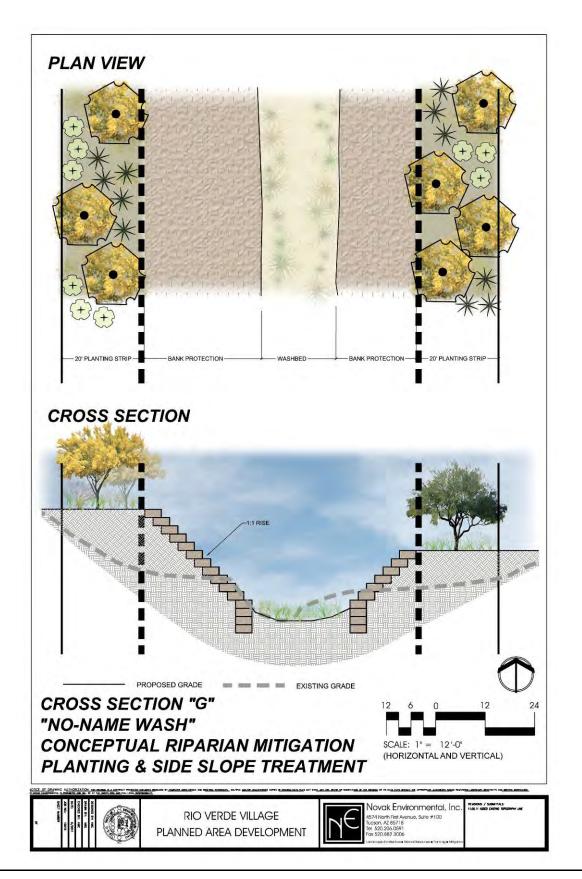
Typical Plan and Cross Section "G" Riparian Mitigation Planting
